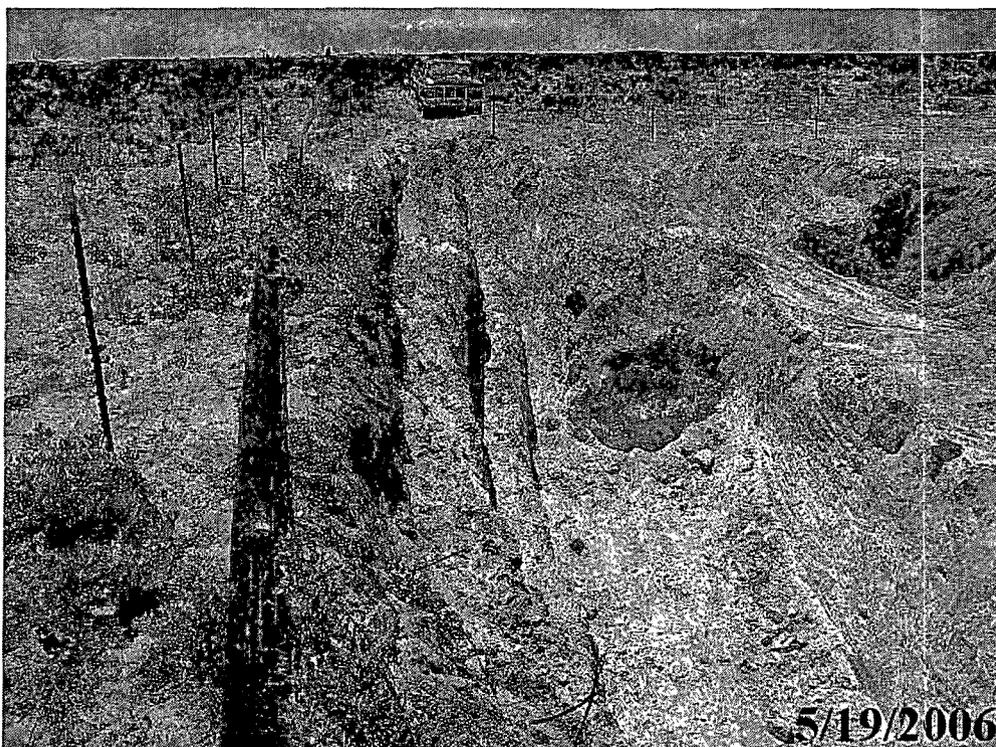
Looking easterly at Site #1 upon completion of backfilling.
